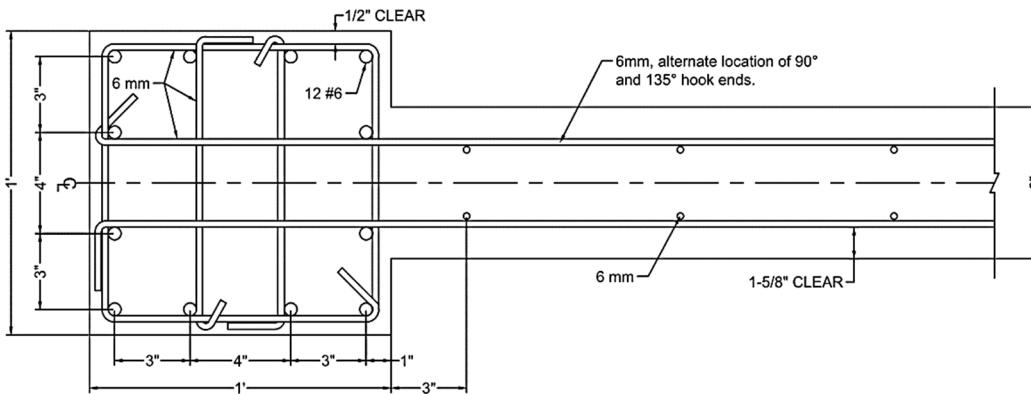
Shear Wall Specimen B9R – Cross Section (Oesterle et al. 1979)
